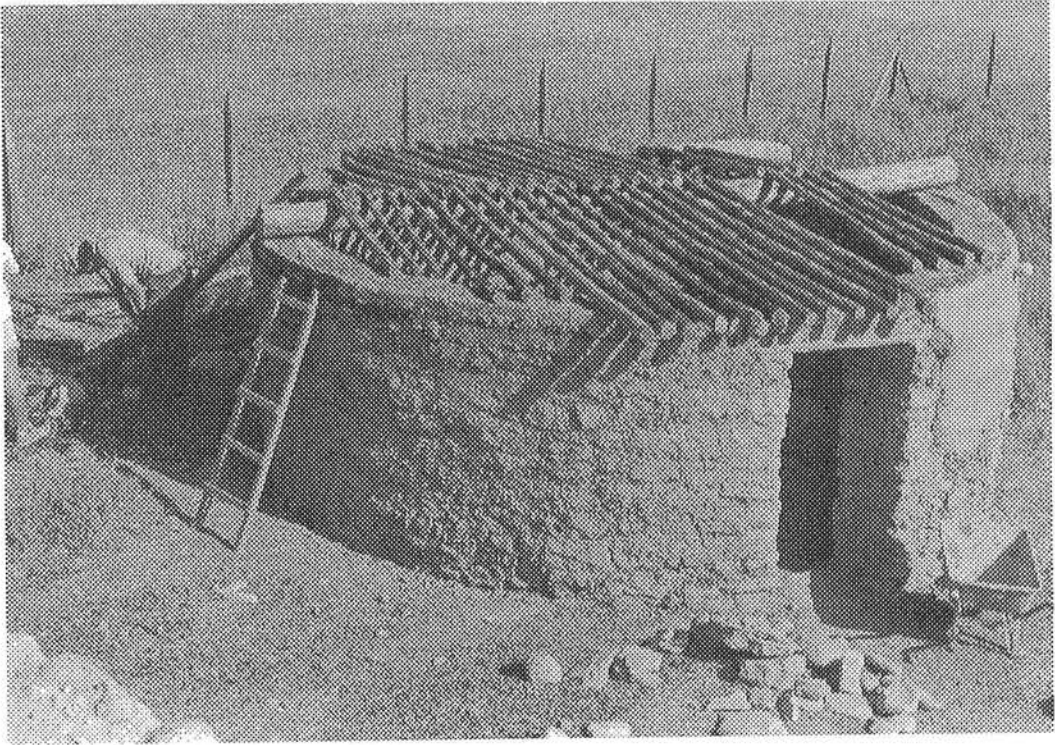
LEV, RH2 ridge pole and rafters for roof being assembled.
